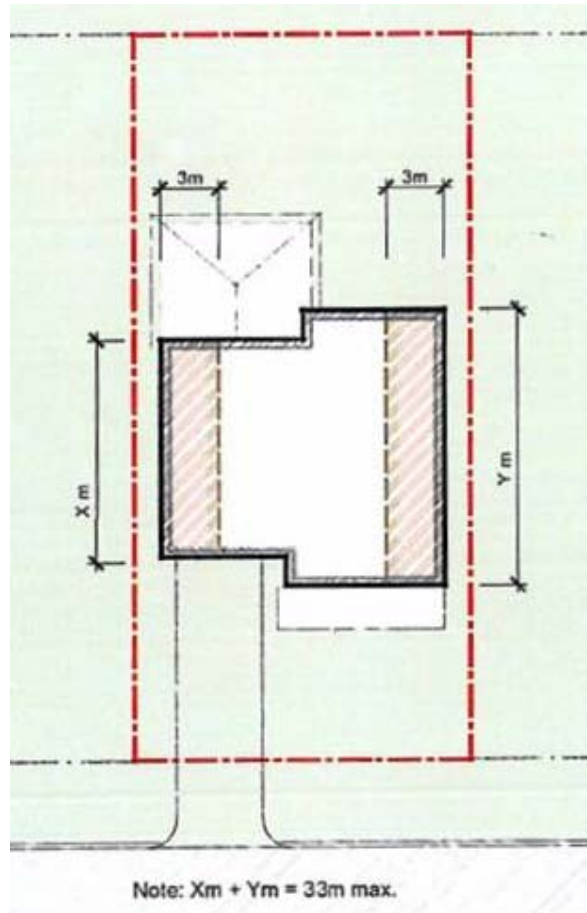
Maximum Total First Floor Wall Length of a Two Storey Dwelling
